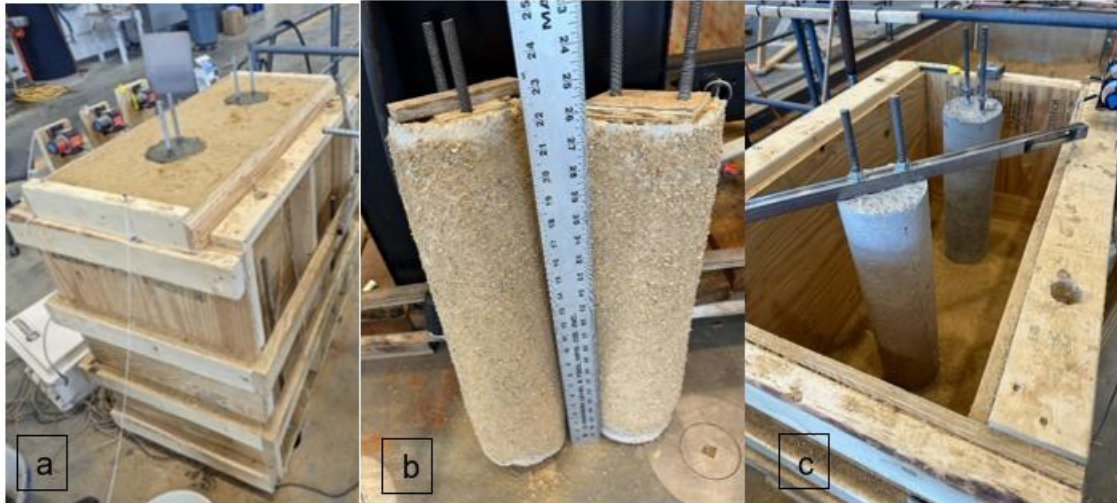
a) cast-in or in-situ specimen setup, b) exhumed cast-in specimens, and c) precast specimens test set-up
